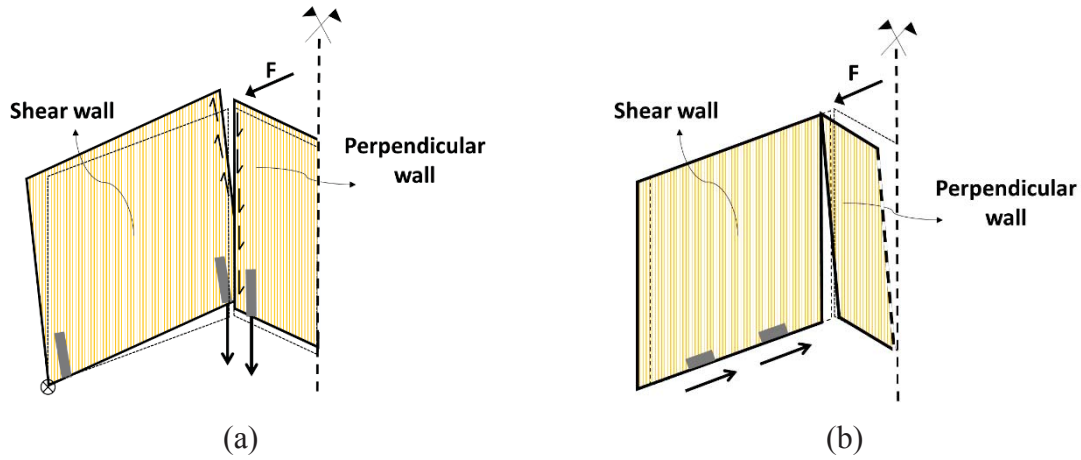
Rocking (a) and sliding (b) mechanism of shear wall connected to perpendicular wall.
